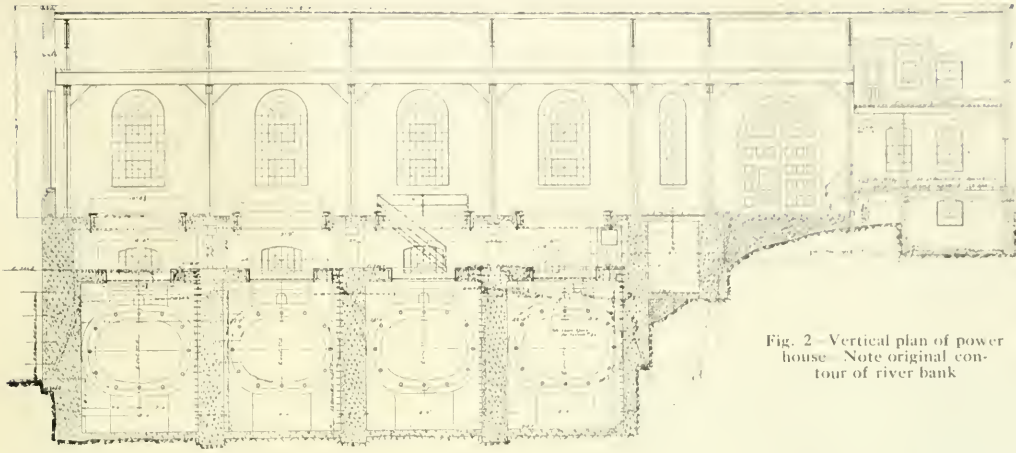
Vertical plan of power house. Note original contour of river bank.
